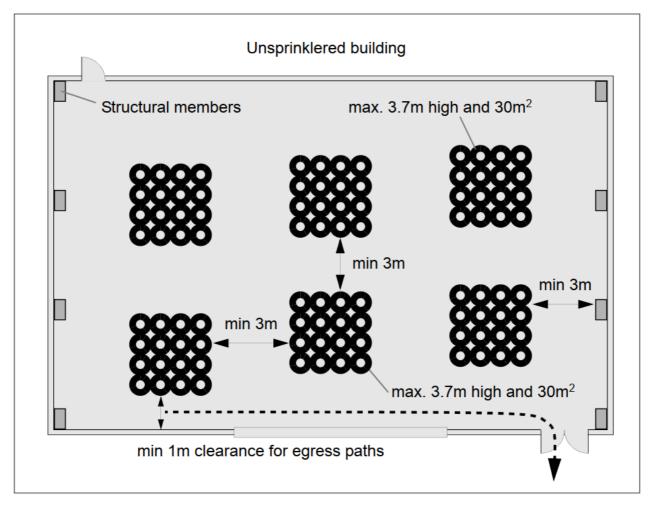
Minimum Clearance Distances for an Unsprinklered Building
